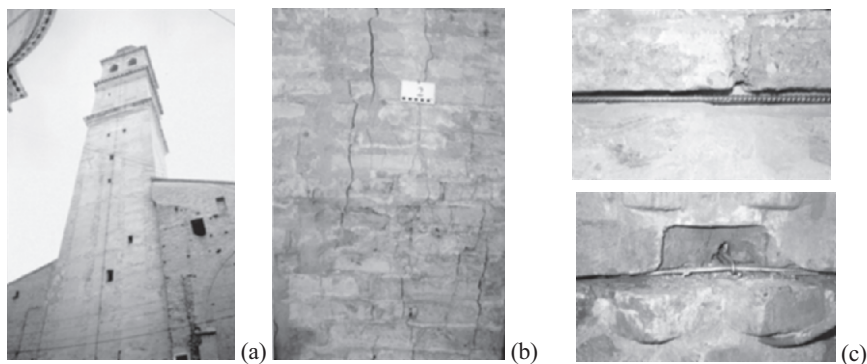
St. Giustina bell tower (Padova): general view (a), typical creep crack (b), application of the technique (c).
